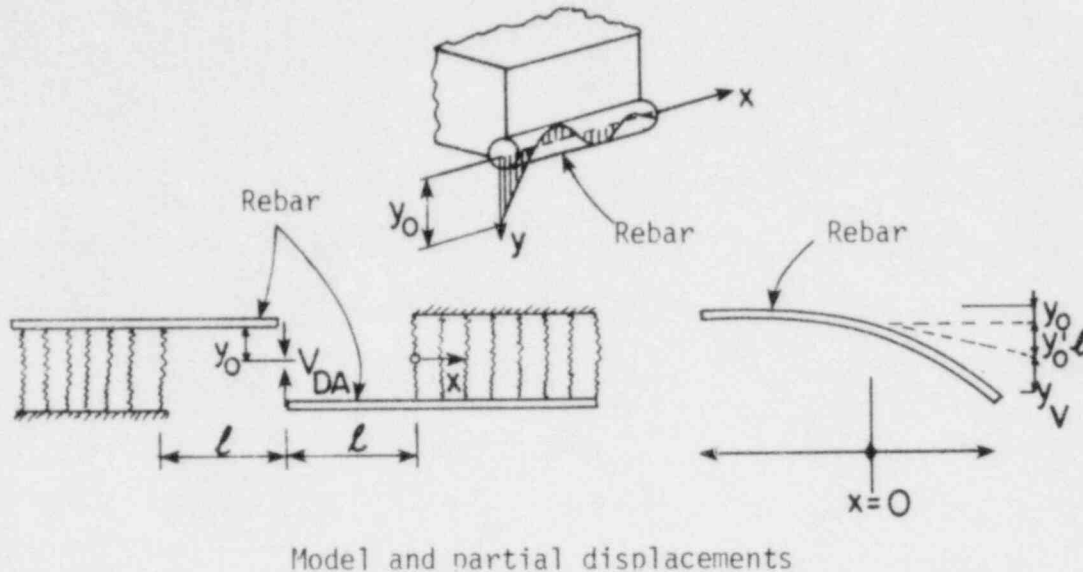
Reinforcing bar as a beam on elastic foundation (Friberg, Ref. 42).
